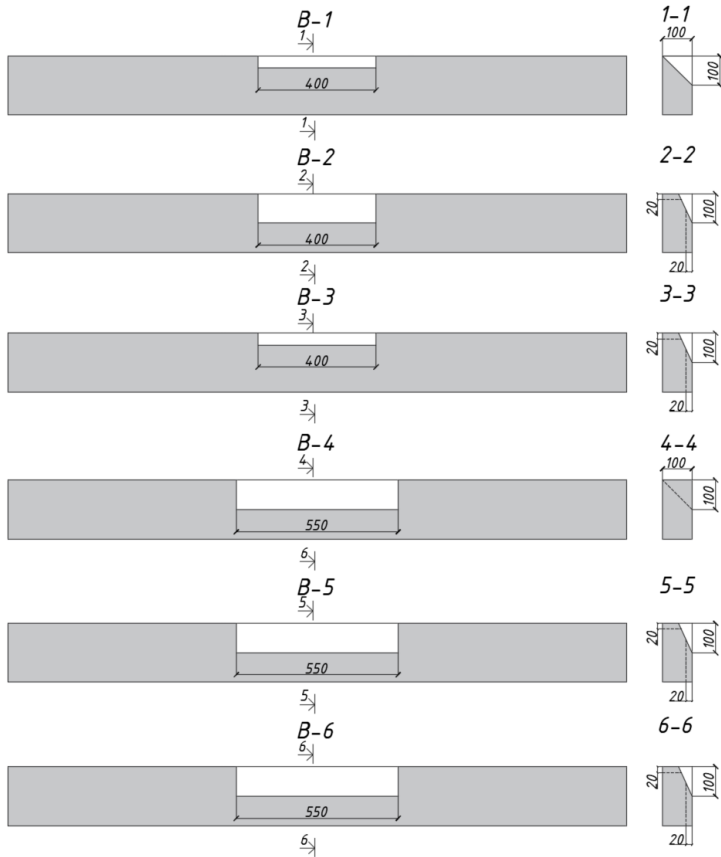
Scheme of damage to a reinforced concrete beam
